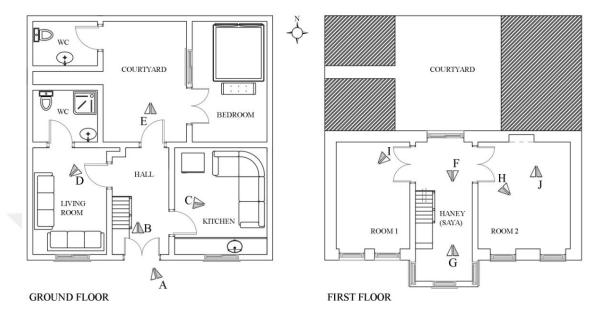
Ground and first floor plans of Bahise Sakallıoğlu House (S.Sevimbige archive, 2017)
